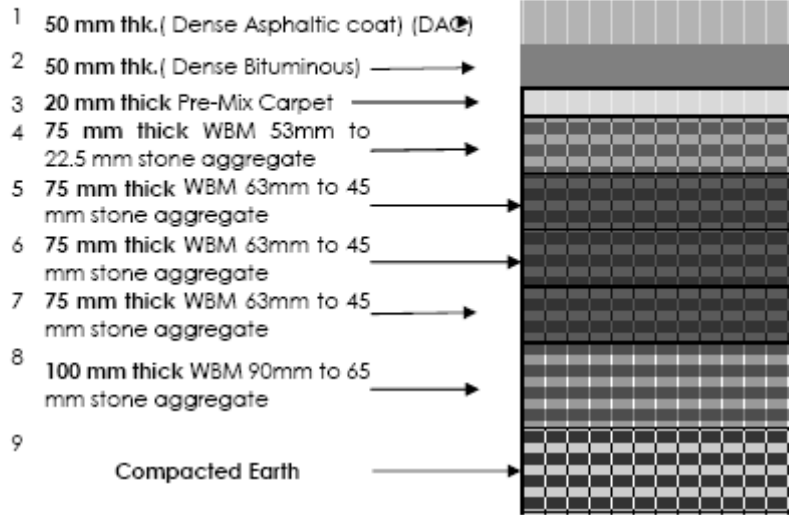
of 4 30' - 00" FEET WIDE ROAD (ROAD TYPE II)
